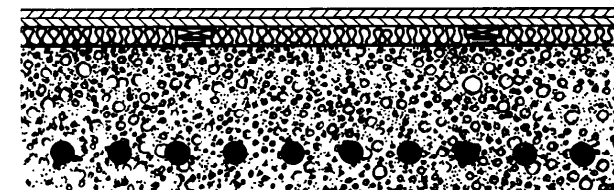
WALL AND PARTITION CONSTRUCTION, NOISE CONTROL
